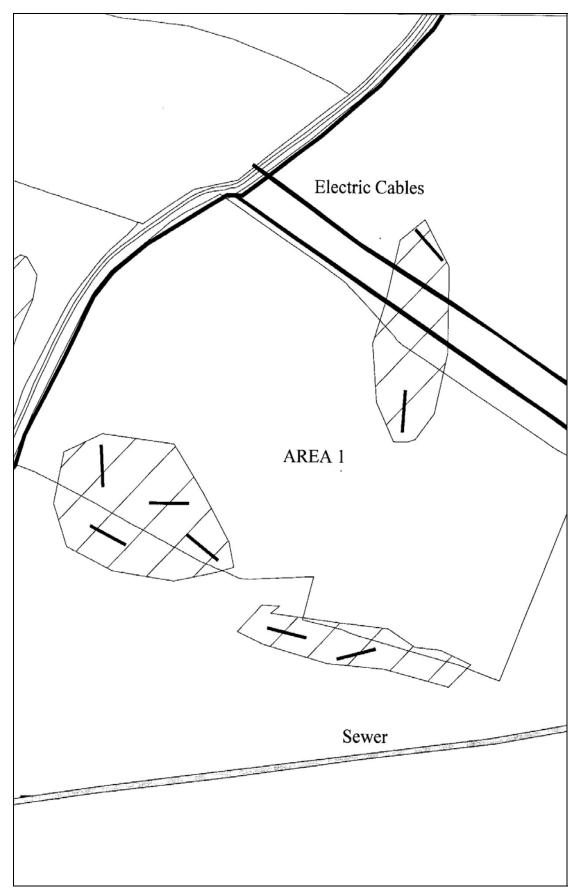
Proposed Trenches in Area 1 (Scale 1:2850)
